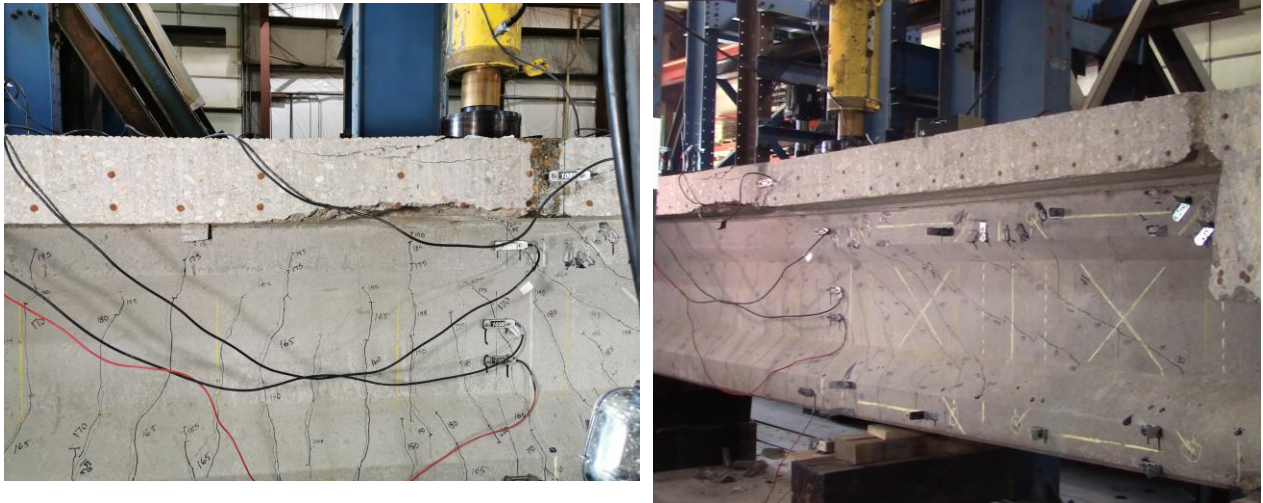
Crushing Failure in Top Slab in Test-1 on I-Beam 9
